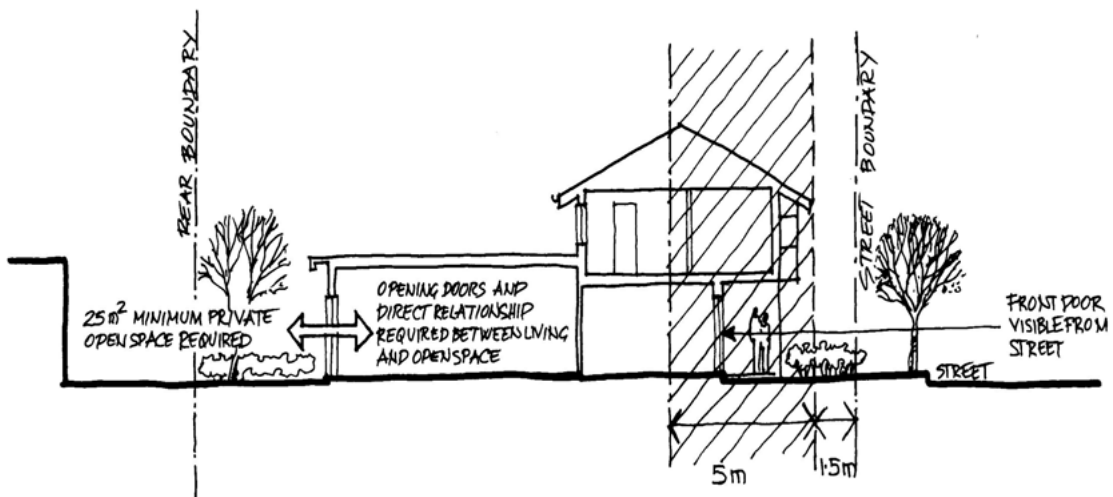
Section of two storey courtyard dwelling.
